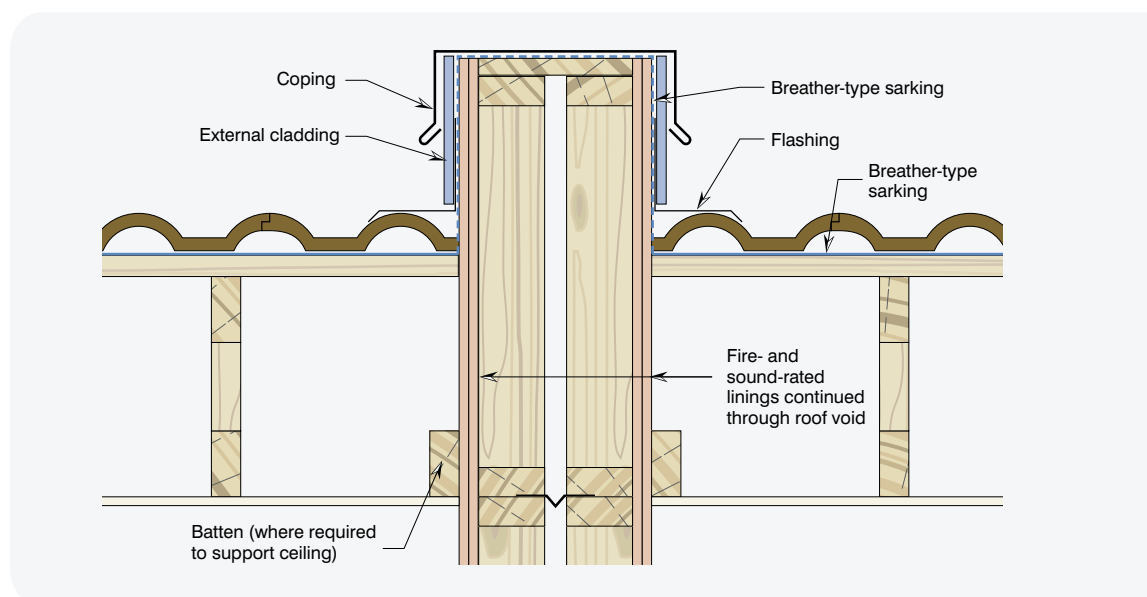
Fire- and Sound-rated wall in the roof void to form parapet – FRL 90 minutes – elevation view.
